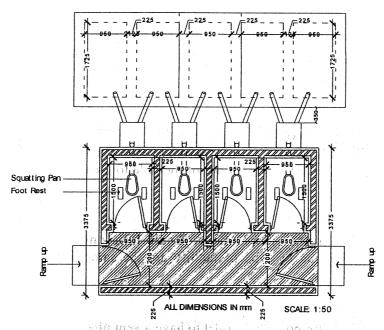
Floor Plan of the 4-compartment Pour Flush Toilet
